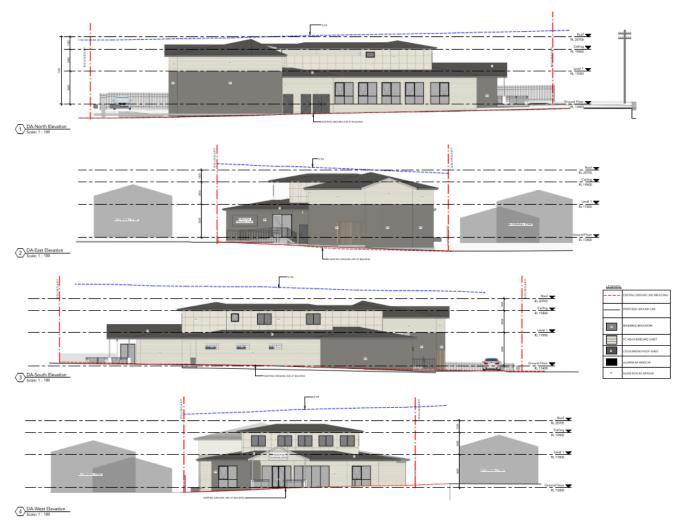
Proposed Elevations (Source: Team 2 Architects)
